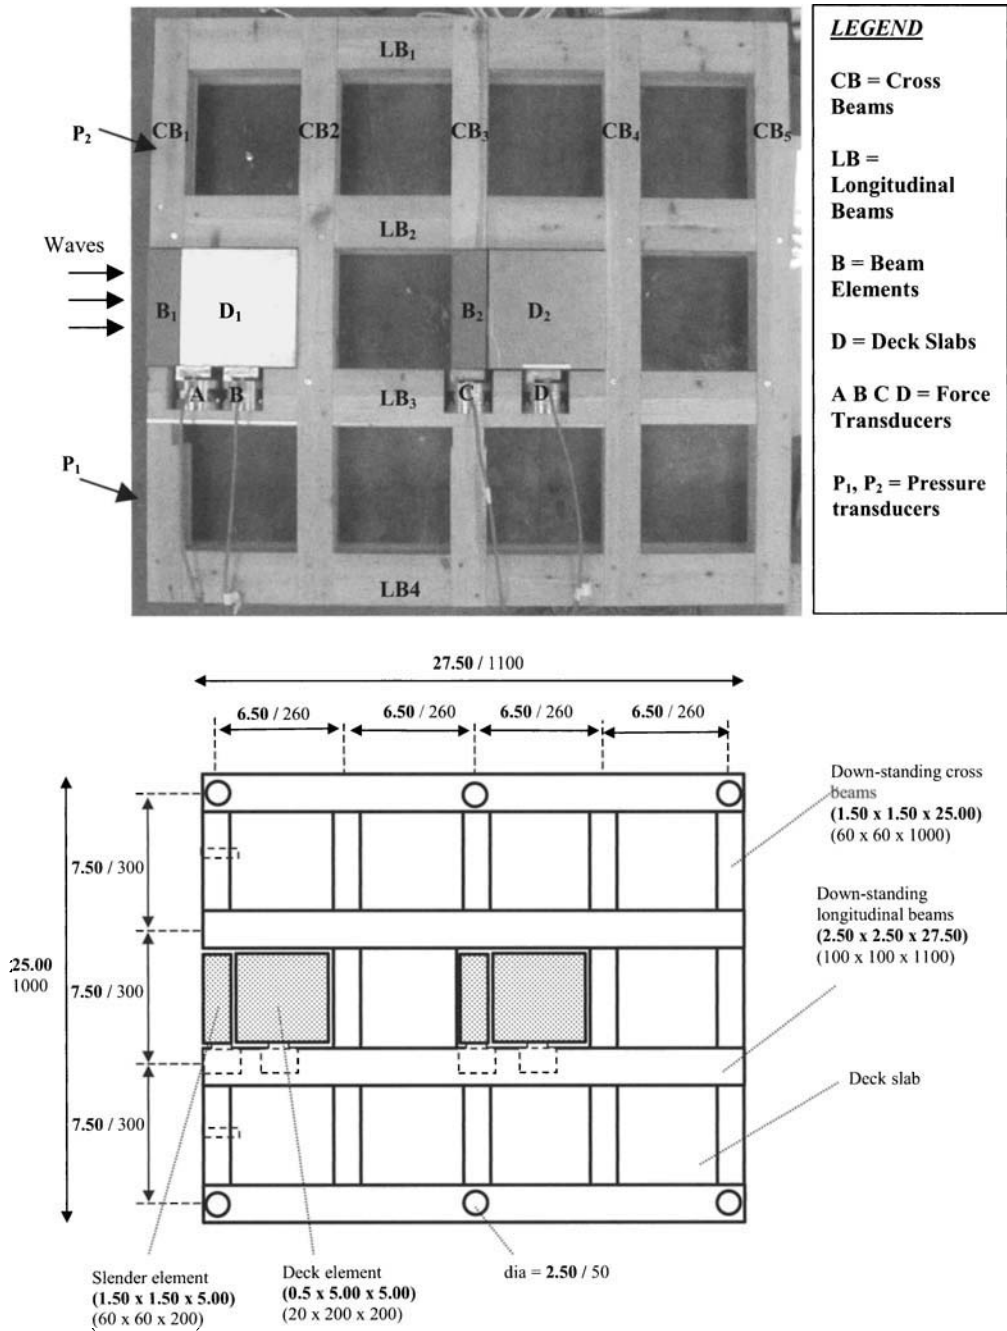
Model test device: downstanding frame of cross and longitudinal beams – plan views
